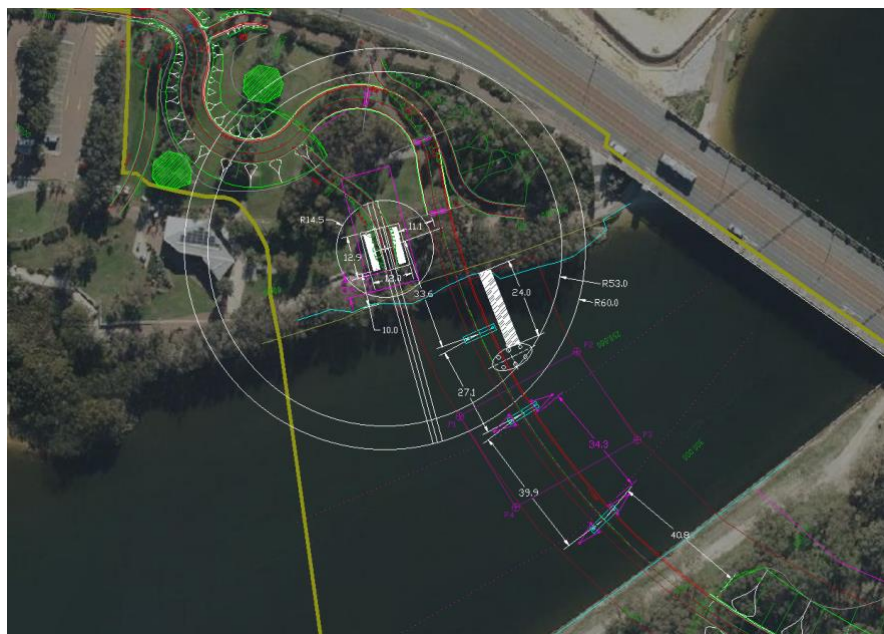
Typical set-up during Pt Fraser pier / pylon installation (access to pile cap via floating deck)
